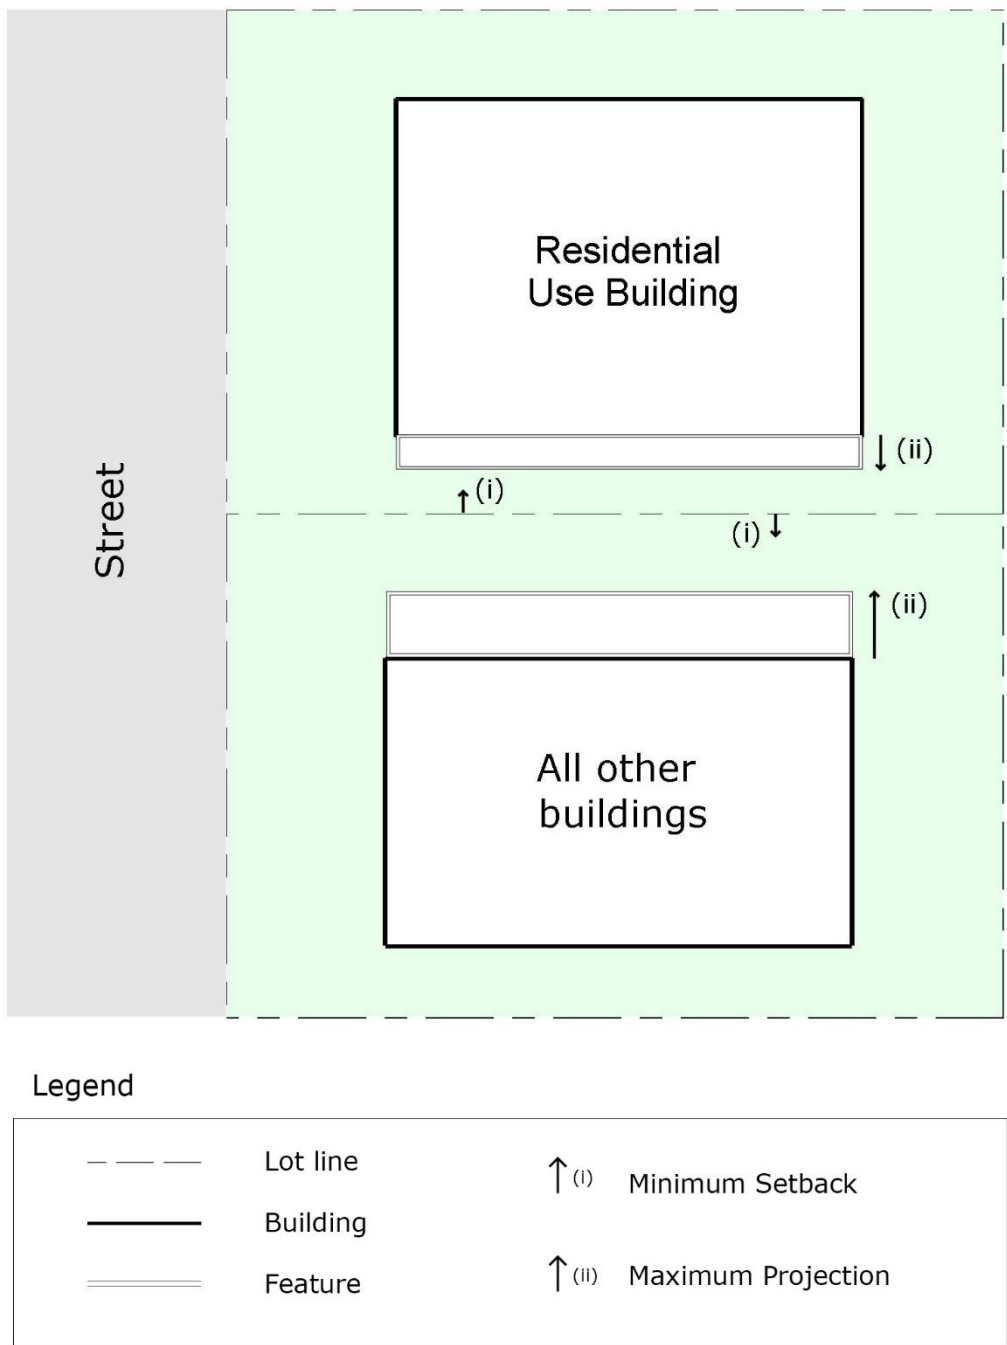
demonstrates the minimum setbacks and maximum projections for eaves, eavestroughs and gutters. The minimum setback and maximum projection for residential use buildings as described in 204 10(a) is shown in the top image and the minimum setback and maximum projection for all other buildings as described in 204 10(b) is shown in the bottom image.
